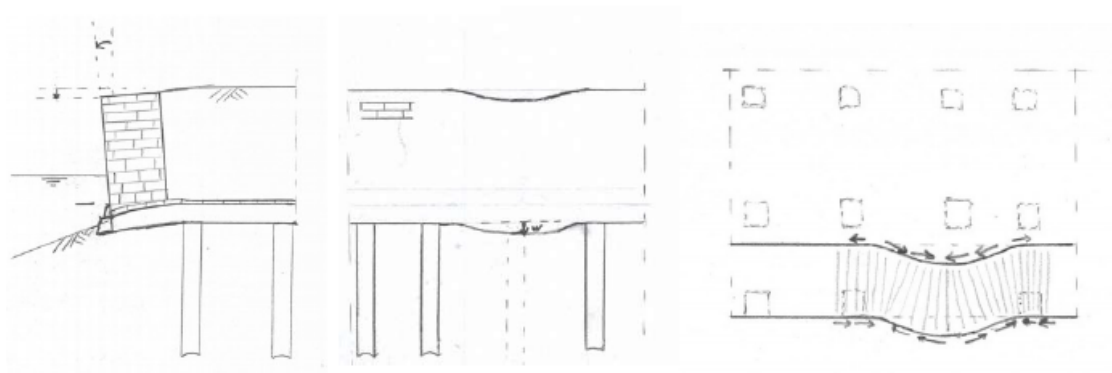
Deformed stage of quay walls under the condition of a partly failing pile foundation. (l) Cross section, (m) longitudinal section and (r) top view.
